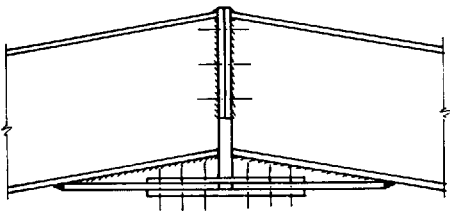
Bolted apex connection with splice plates. (This is unlikely to be an economic connection in practice)
